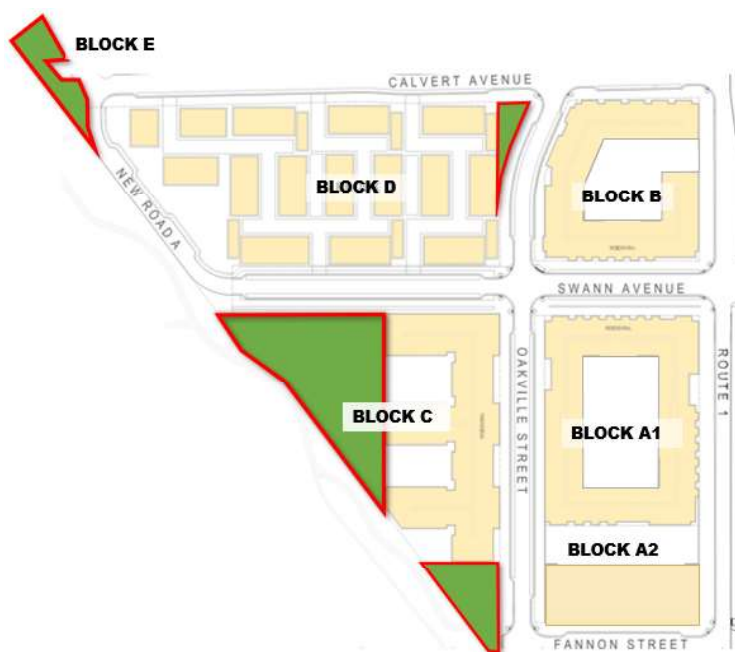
On-site Publicly Accessible Open Space (red outline) in proposed Oakville Triangle
